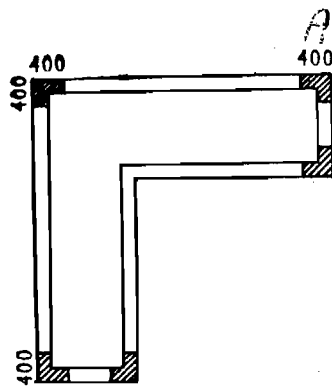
Schematic Diagram of central section of outer wall and corners (the shaded portions indicate the corners; the rest is the central section.)
